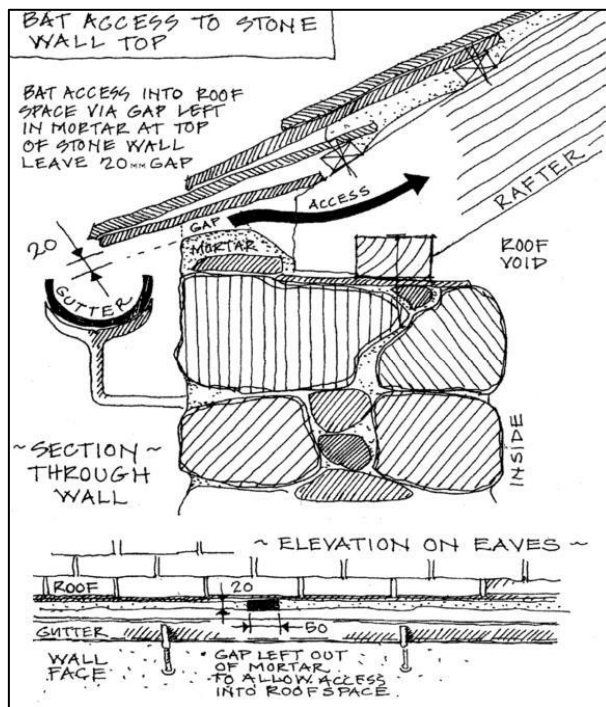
During construction, gaps can be incorporated under the tiles at the top of the brick wall that are suitable for crevice dwelling species (Natural England, 2007).
